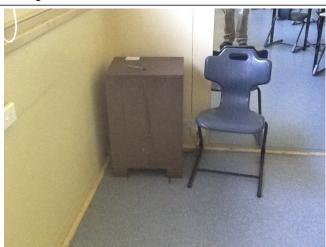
Photo026 Result: Asbestos - Presumed Positive Building/Level: Building 4-Level One Room/Location: 4R1011 (Room 12)-Northwest Feature/Material: Heater-Insulation
